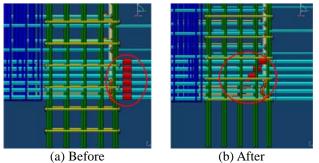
Rearranging couplers between reinforcement in preceding core walls and transfer walls to improve constructability
